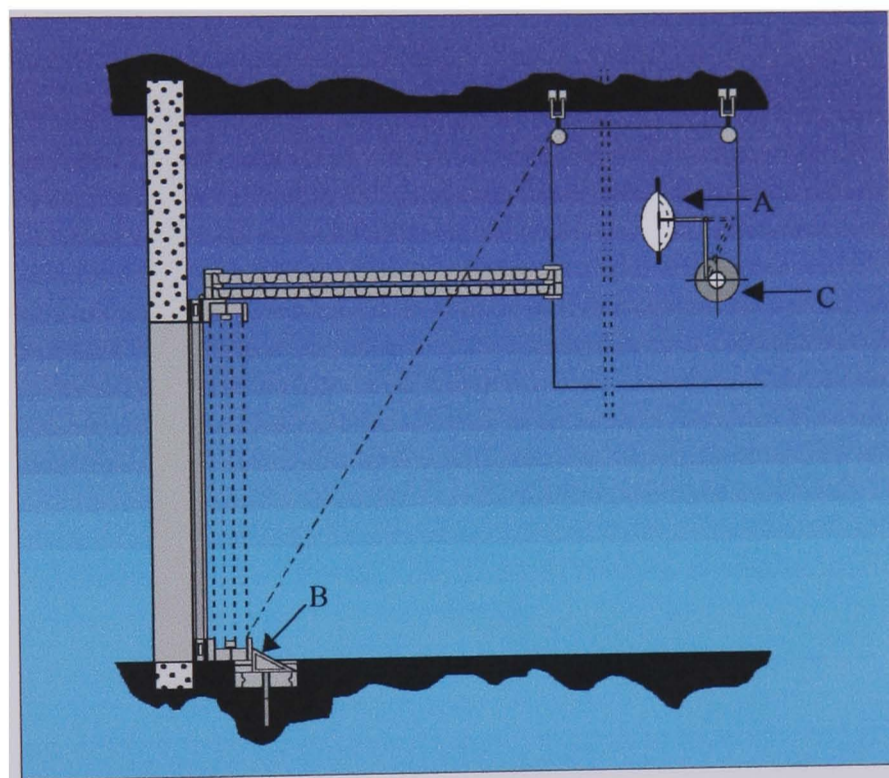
Side elevation of the explosion door. Where A is a sensor, B is the locking mechanism, and C is the pulley and wire for the door release.
